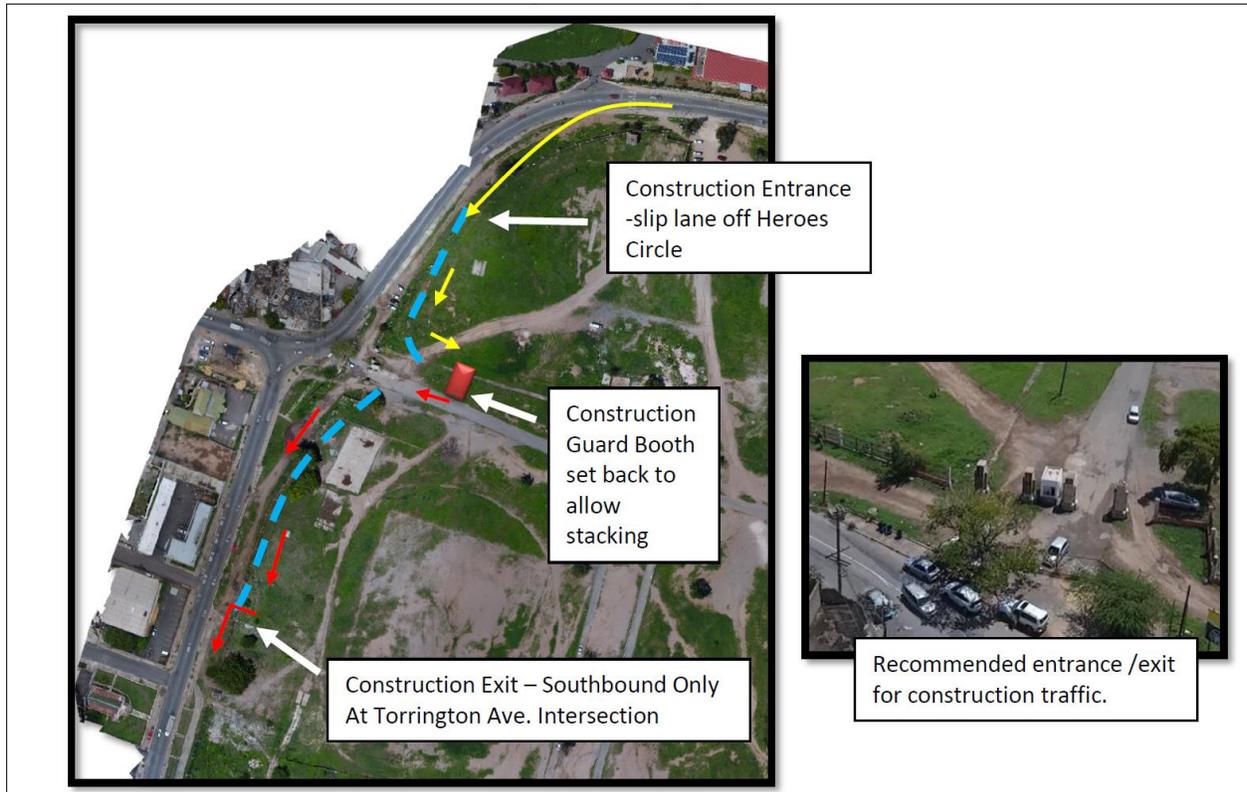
Construction Traffic Routing (Source: Traffic Impact Study, 2020)
